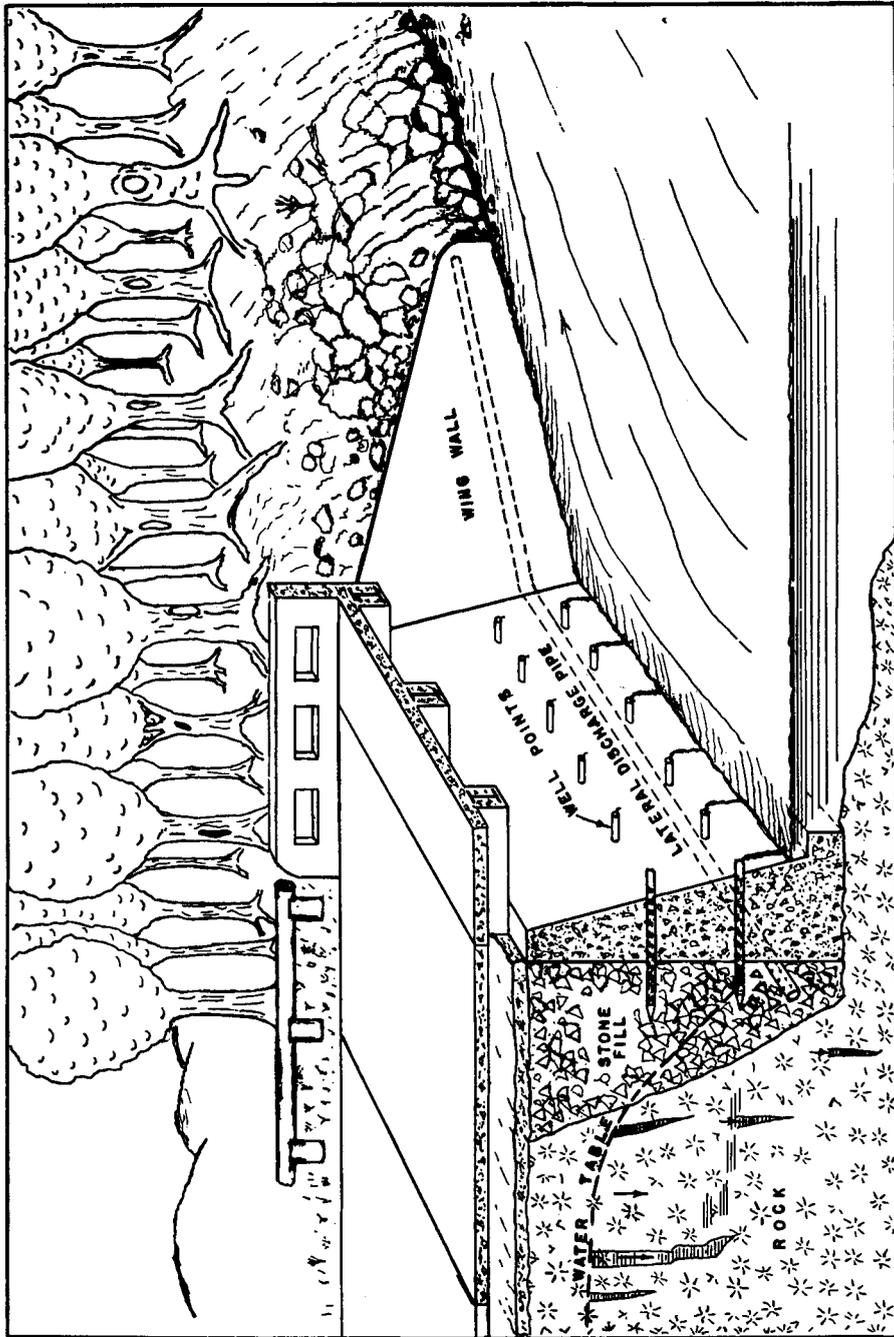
Diagram of a bridge abutment with porous fill and screened drain pipes designed to relieve the water pressure and to prevent the abutment from acting as a ground-water dam.
